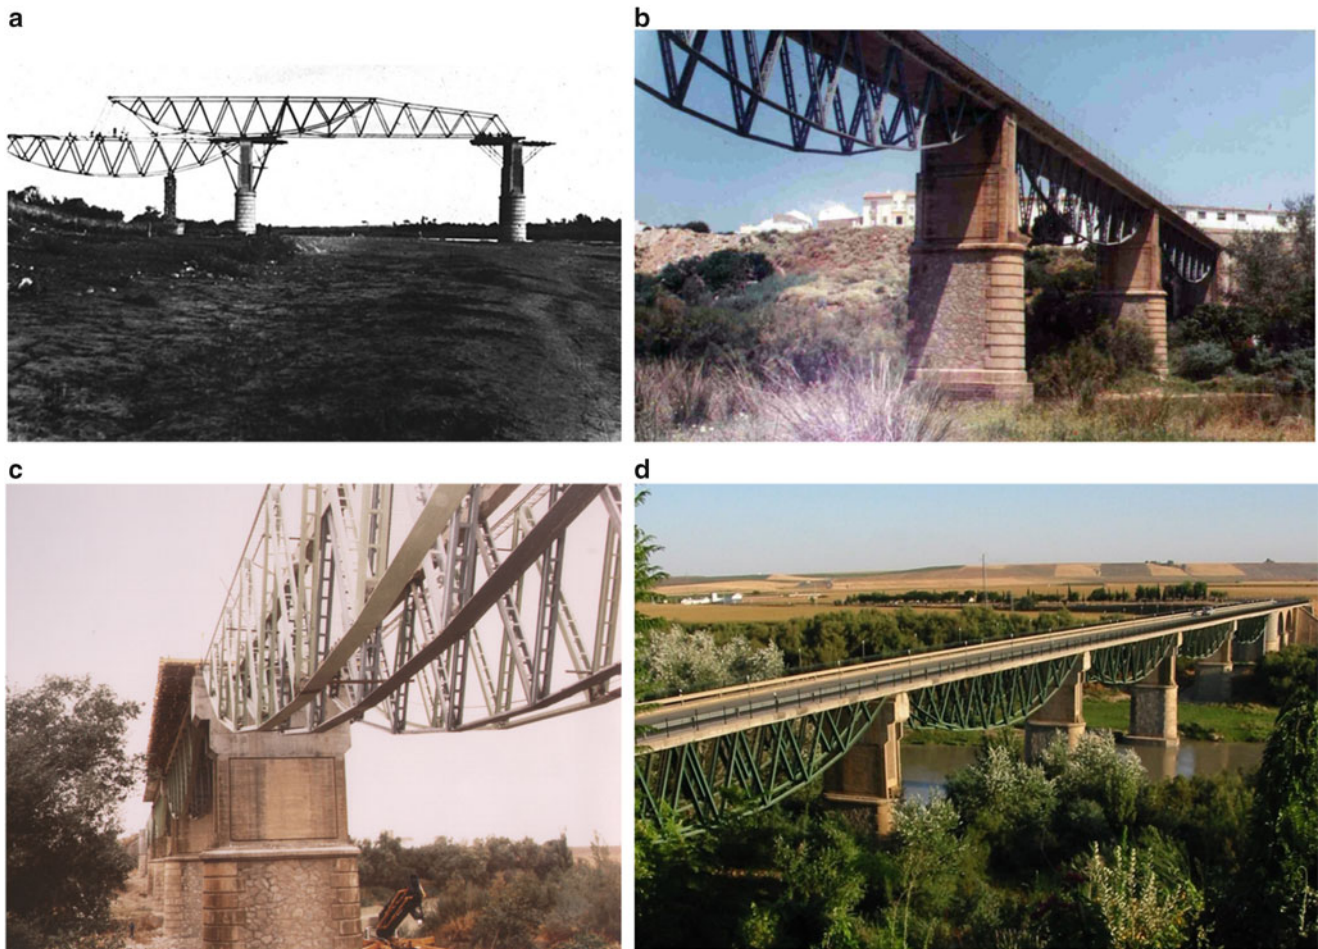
(a) Original Bridge under construction, 1940; (b) original Bridge in-service; (c) operations of deck's width increment; (d) current bridge in service
